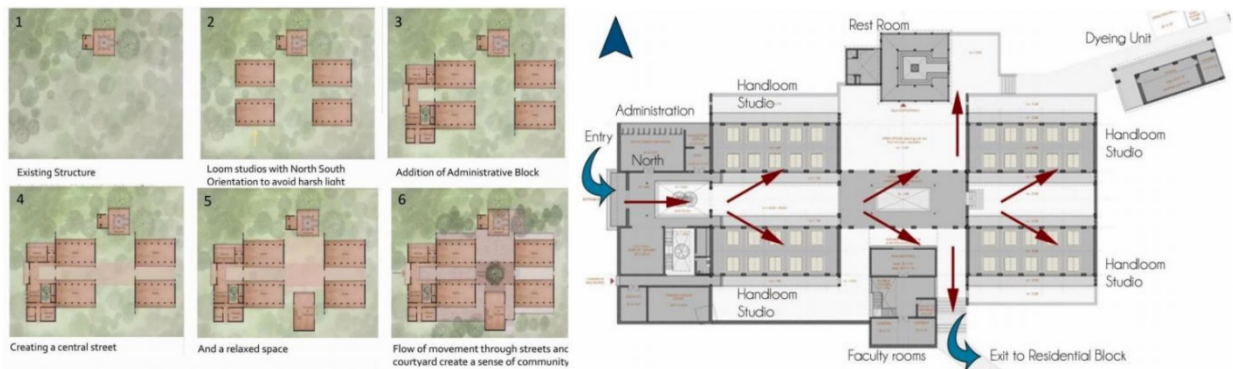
Design development Figure 4.16 Floor plan and circulation of the Handloom school (Academic block)
